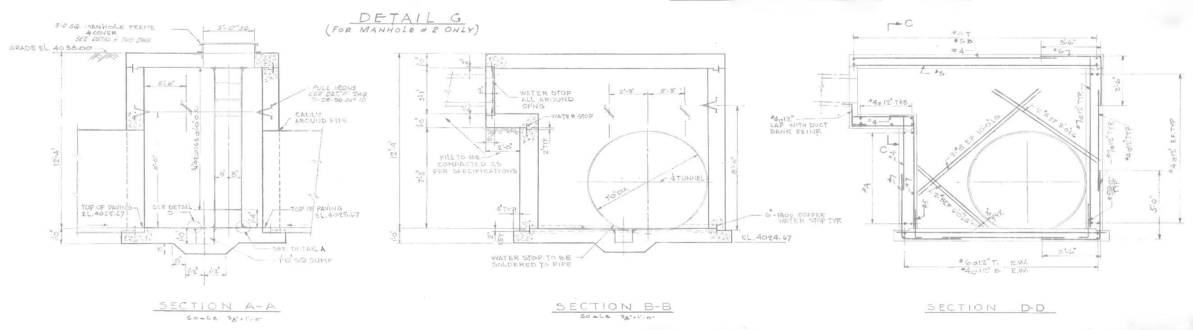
Nike Zeus Launch Area Tunnel section views from 1959 WS-IA plans.
